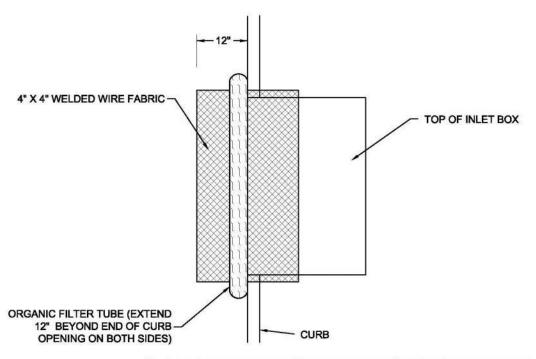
Schematics of 2"x4" Weir Curb Inlet Protection (Source: Modified from Washington Suburban Sanitary Commission Detail SC-16.0)
